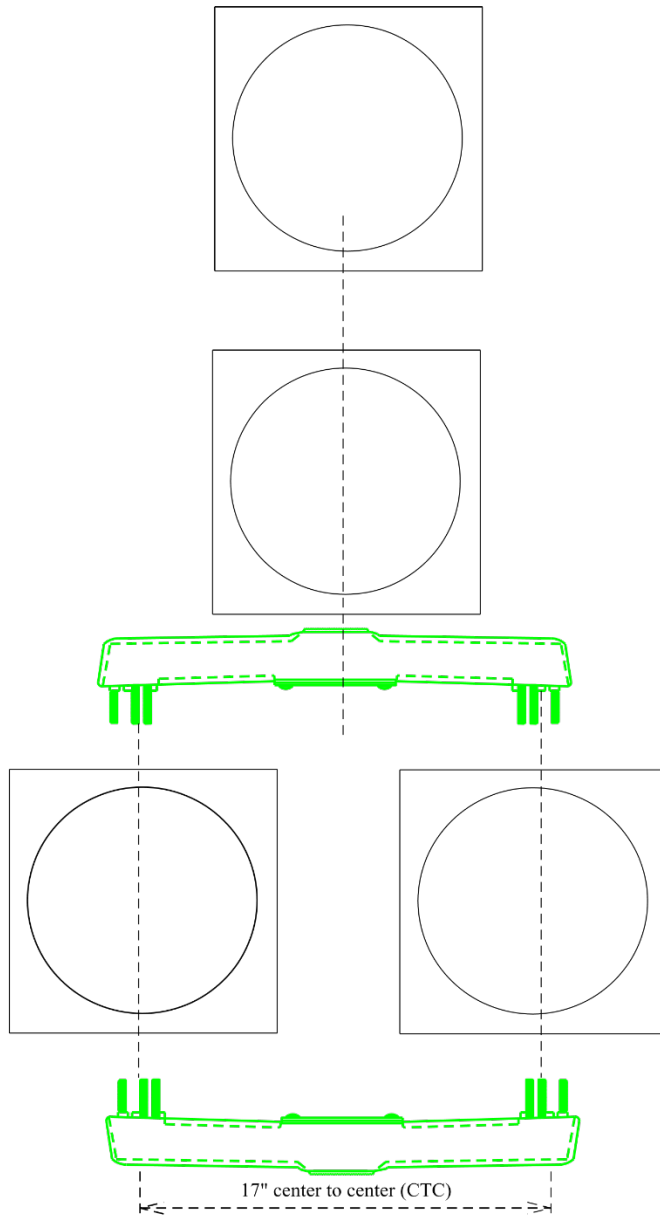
4-SECTION CLUSTER STANDARD SIGNAL HEAD, TERMINAL BLOCK MOUNTING LOCATION, & BACKPLATE
